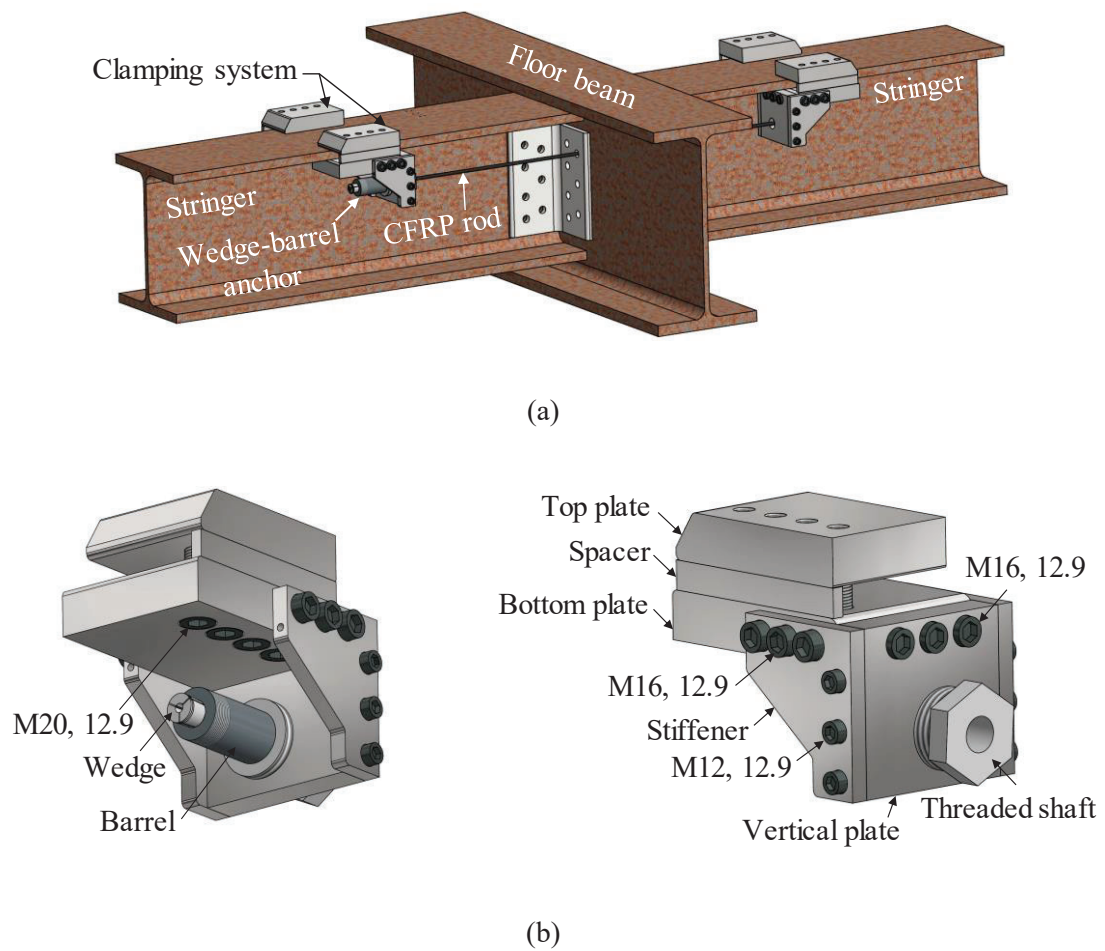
Proposed strengthening system for double-angle stringer-to-floor-beam connections: (a) Configuration of the proposed strengthening system; (b) Different parts of the strengthening system.
